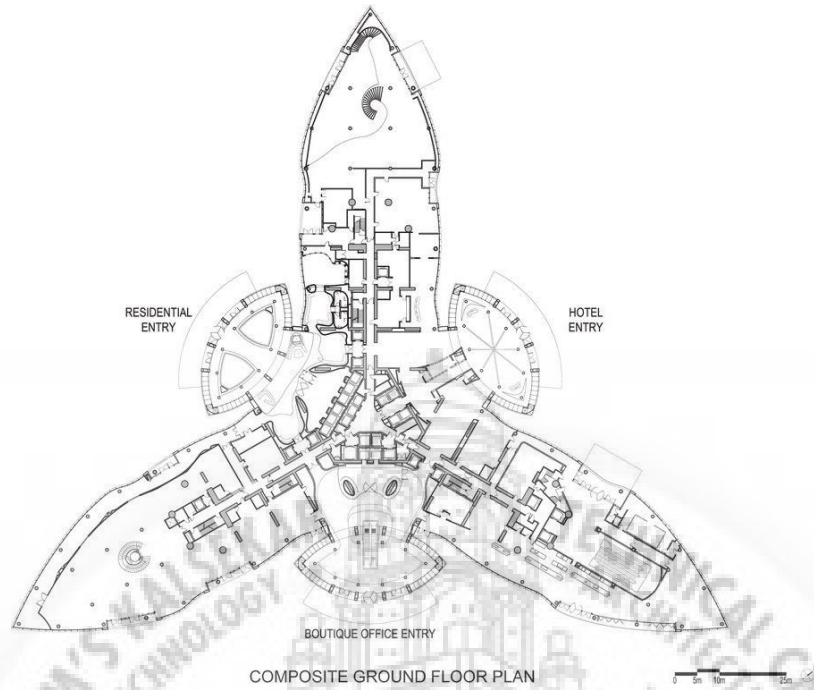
Ground floor plan Burj Khalifa (Source – archichoong)
